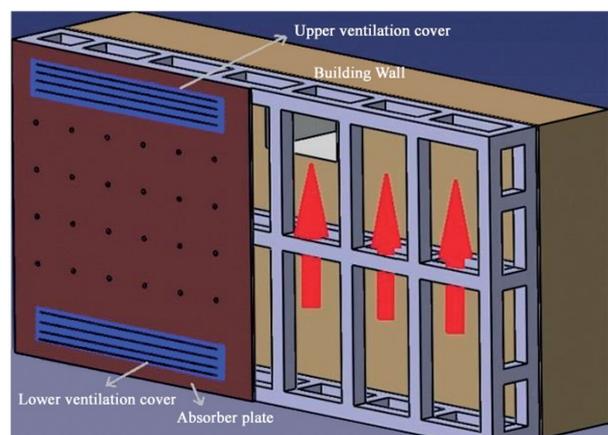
Placing the metal wall on the building façade (Ay and Khanlari, 2015)
